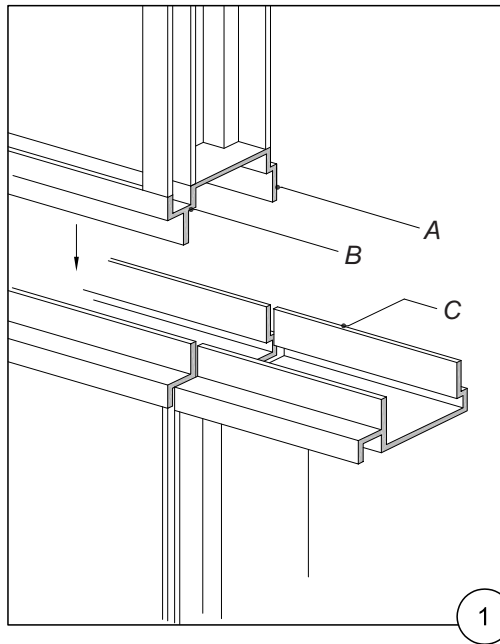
Unitized system — joinery — typical expansion joint assembly
